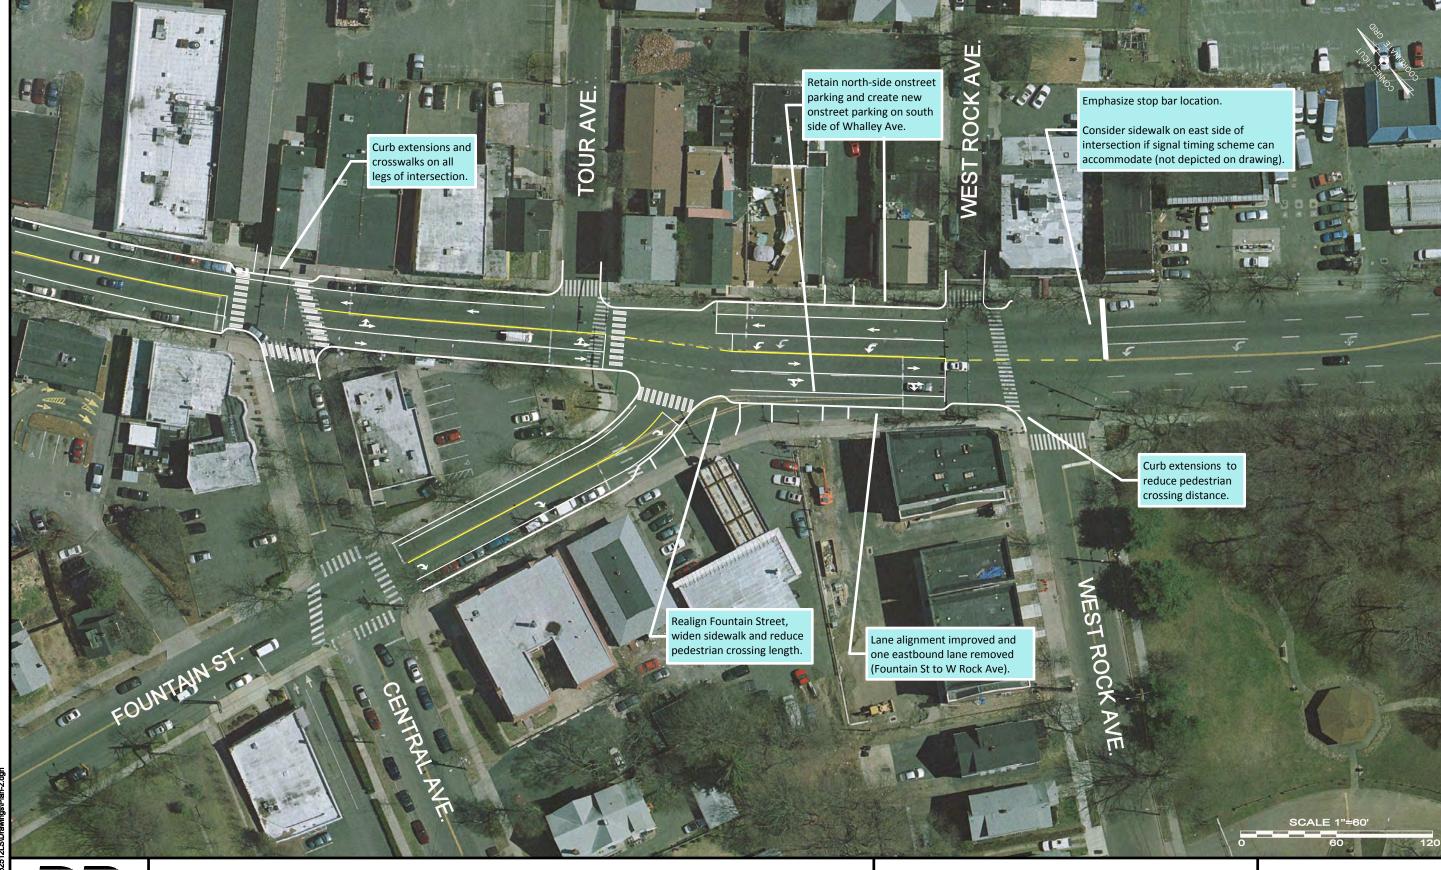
Whalley Avenue, Central Ave to West Rock Ave Concept Sketch
